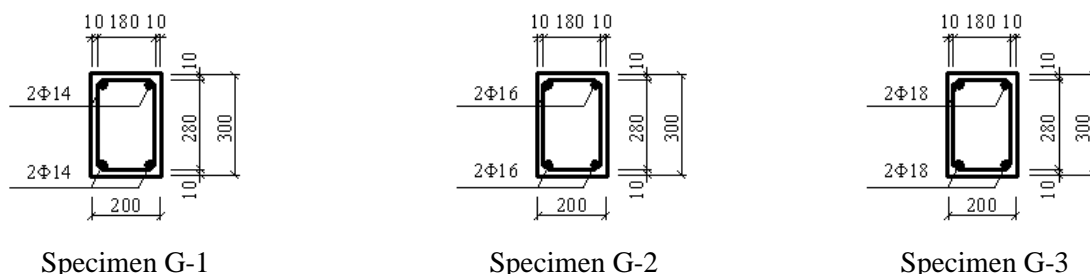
Sections and reinforcement detail of specimens (dimensions in mm)
